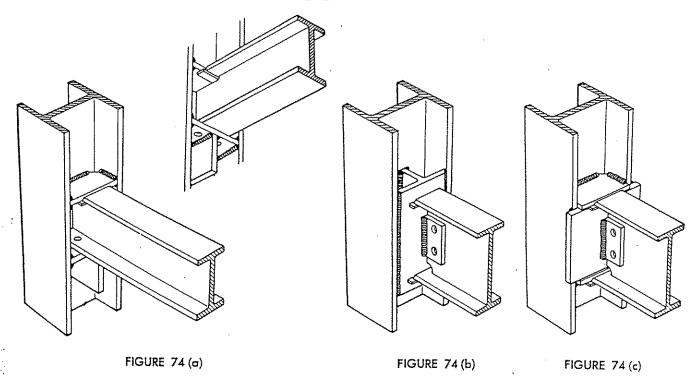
A welded beam-to-column-web connection (AISC Type 1).
